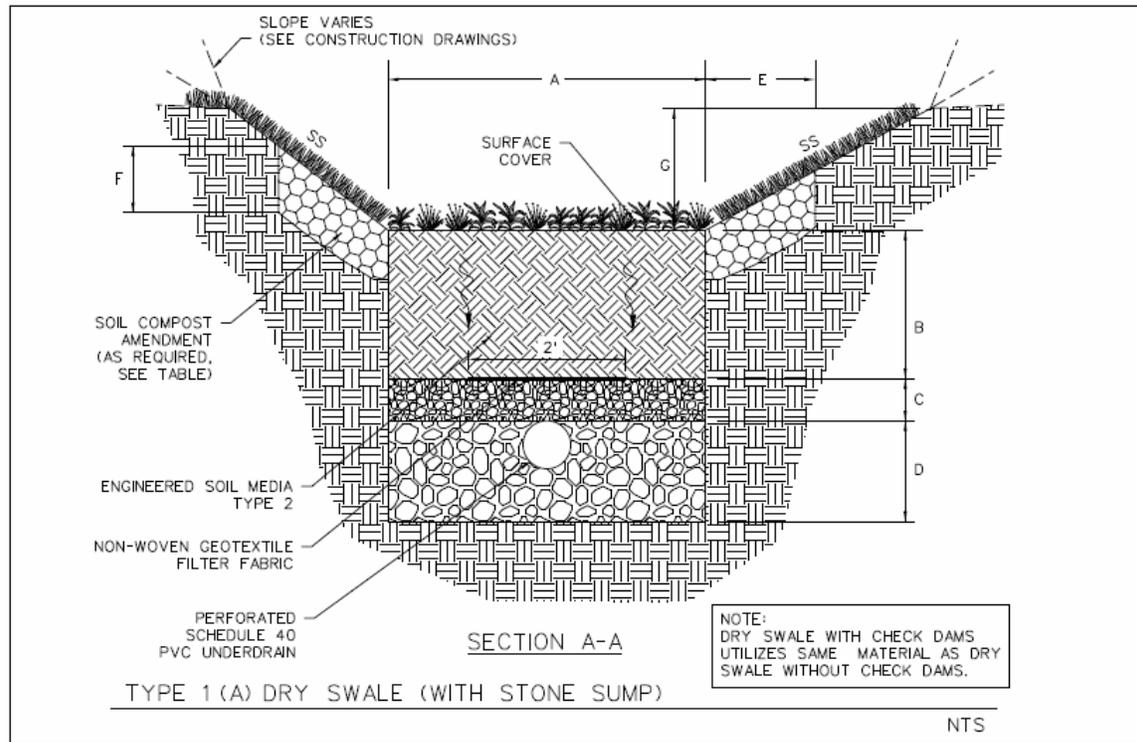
Typical Dry Swale – Level 2 [Cross-section View]
